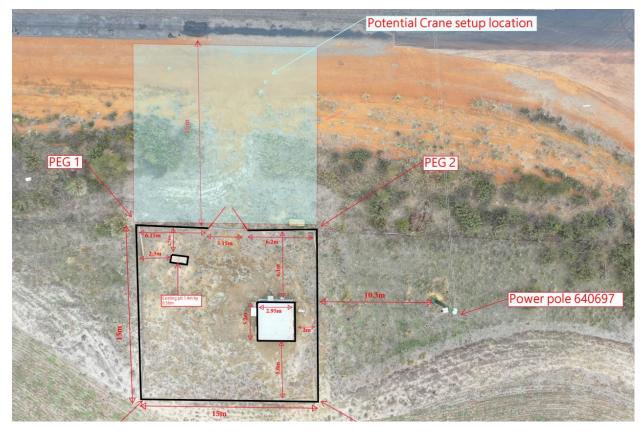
Existing and future access to subject site Source: Nearmap 2024
